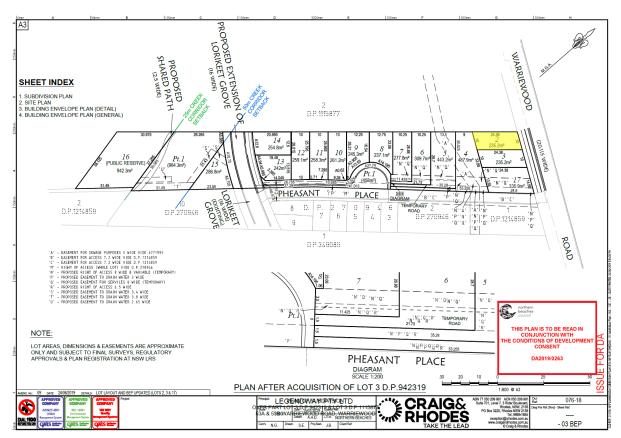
Approved Subdivision Plan DA2019/0263 with Lot 2 highlighted in yellow Source: Northern Beaches Council
